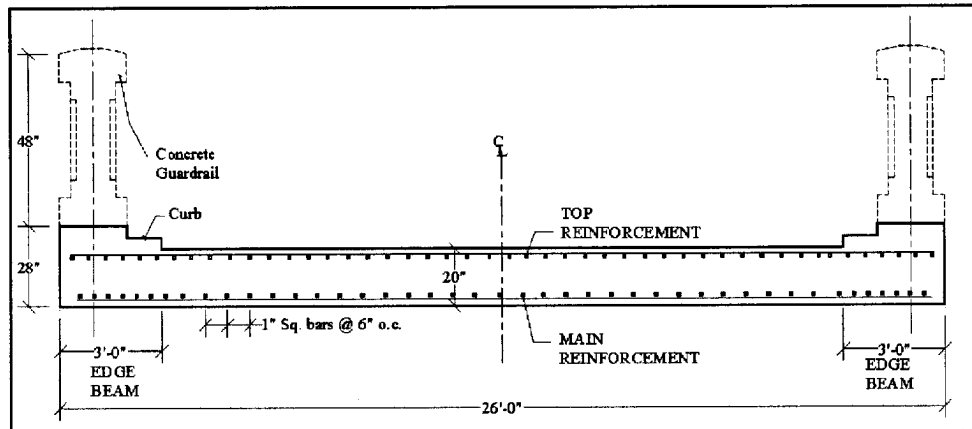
Transverse bridge section with main reinforcement running parallel to traffic
